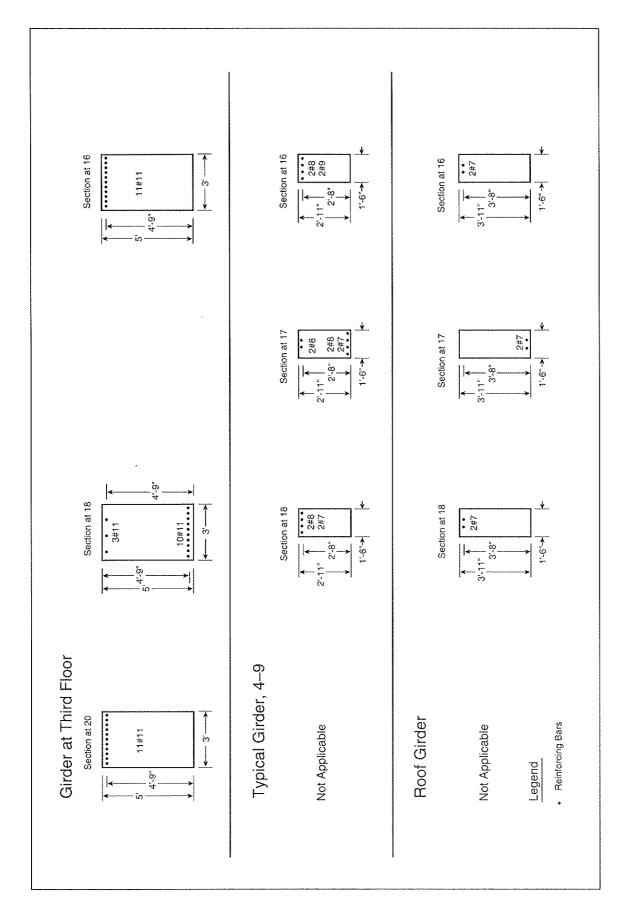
Cross-sectional distribution of girder reinforcing bars.
